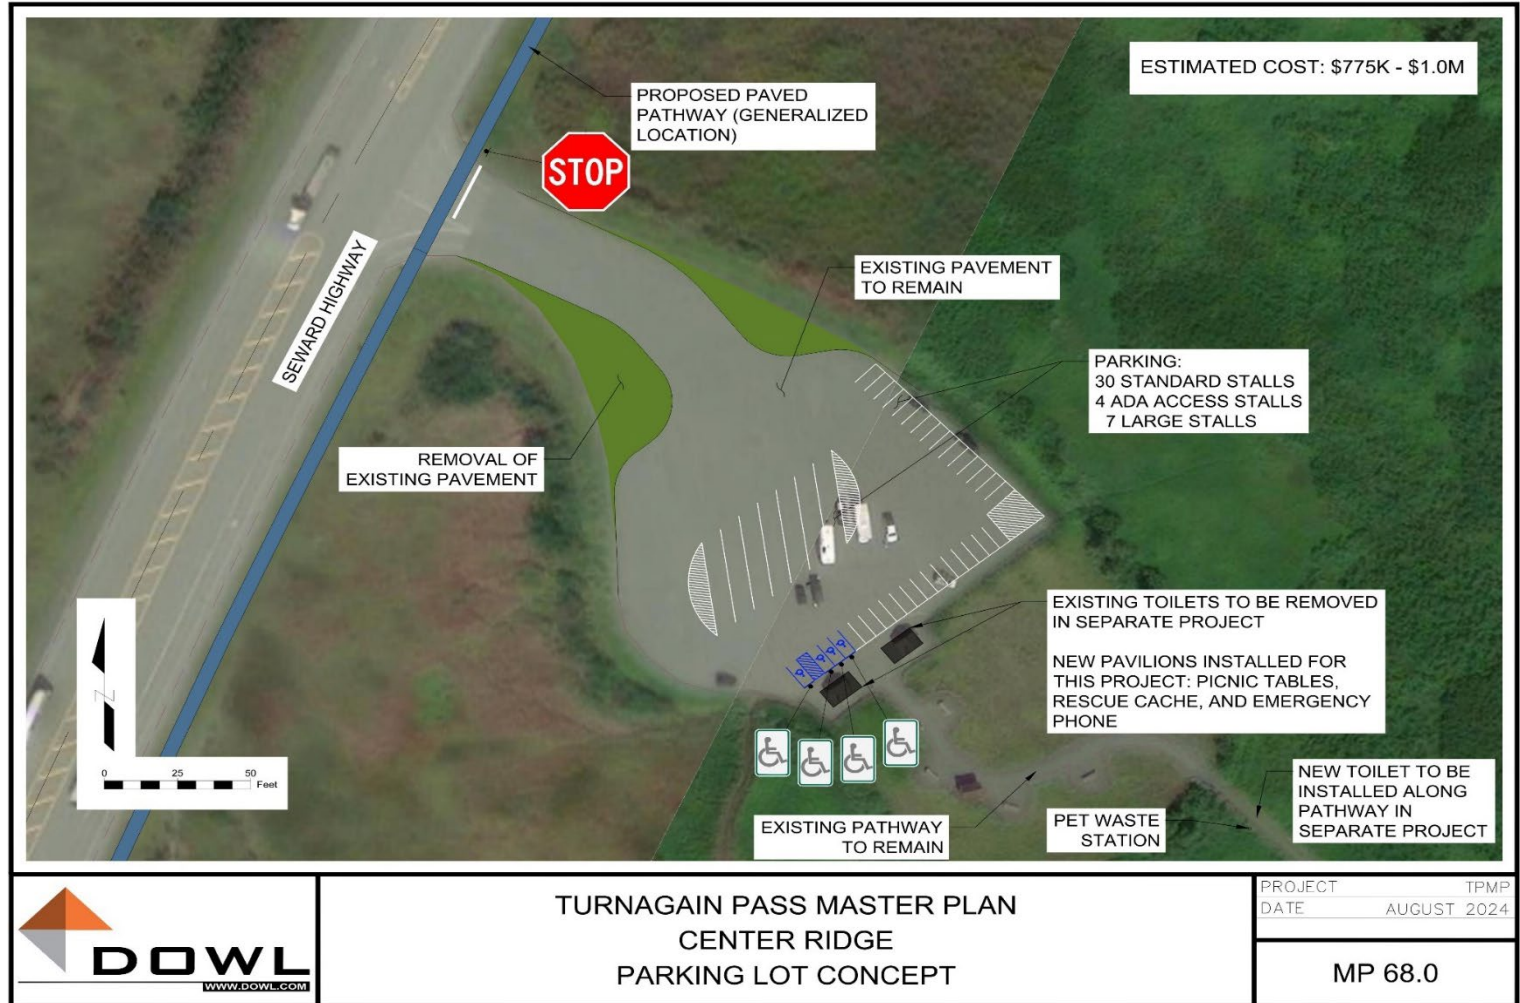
Center Ridge Trailhead Parking Lot Improvements, Conceptual Design
